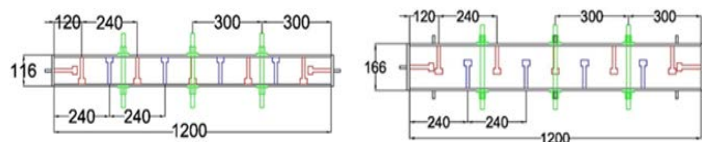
Graph shows the cross section of the walls for specimens with studs spacing of 24 cm
